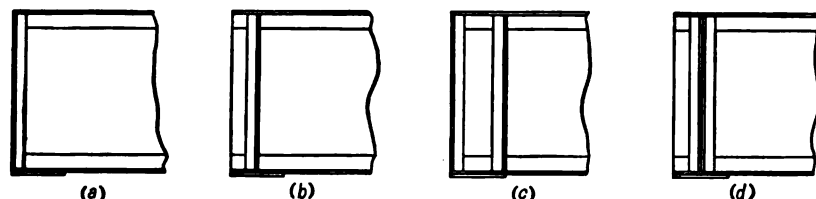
(a). — Methods of Placing Stiffeners at the Ends of Girders.
